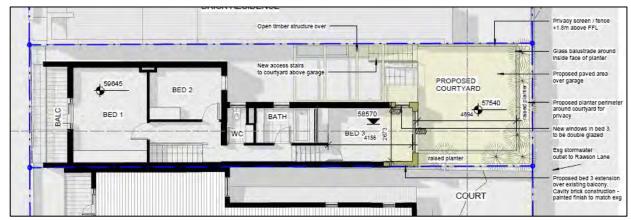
Approved first floor level of DA-160/2020 at 12 Rawson Avenue demonstrating the enclosure of the rear balcony, new window and proposed courtyard/terrace above the garage.
